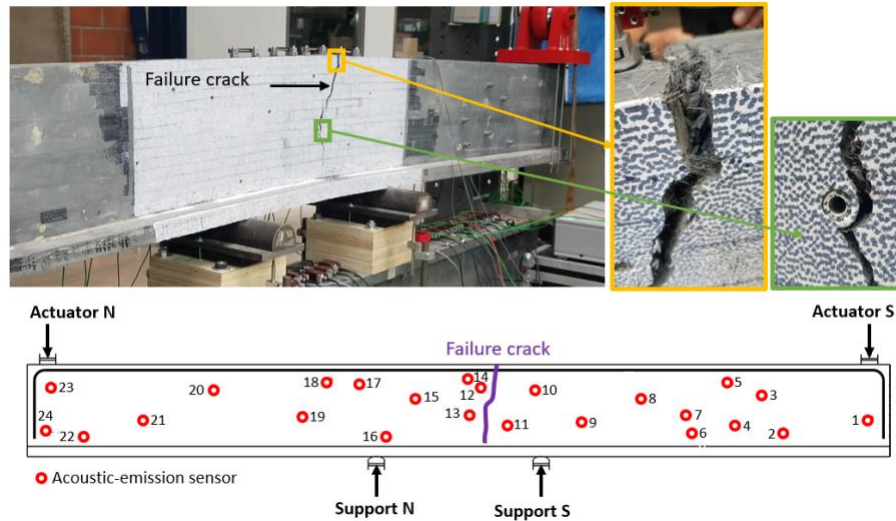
Photograph of the failure crack on the beam and location related to the transducer network.
